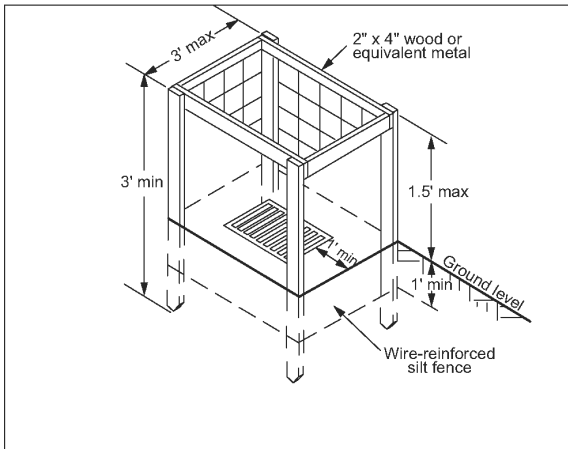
Fabric and supporting Frame for Inlet Protection (Sd2-F)
